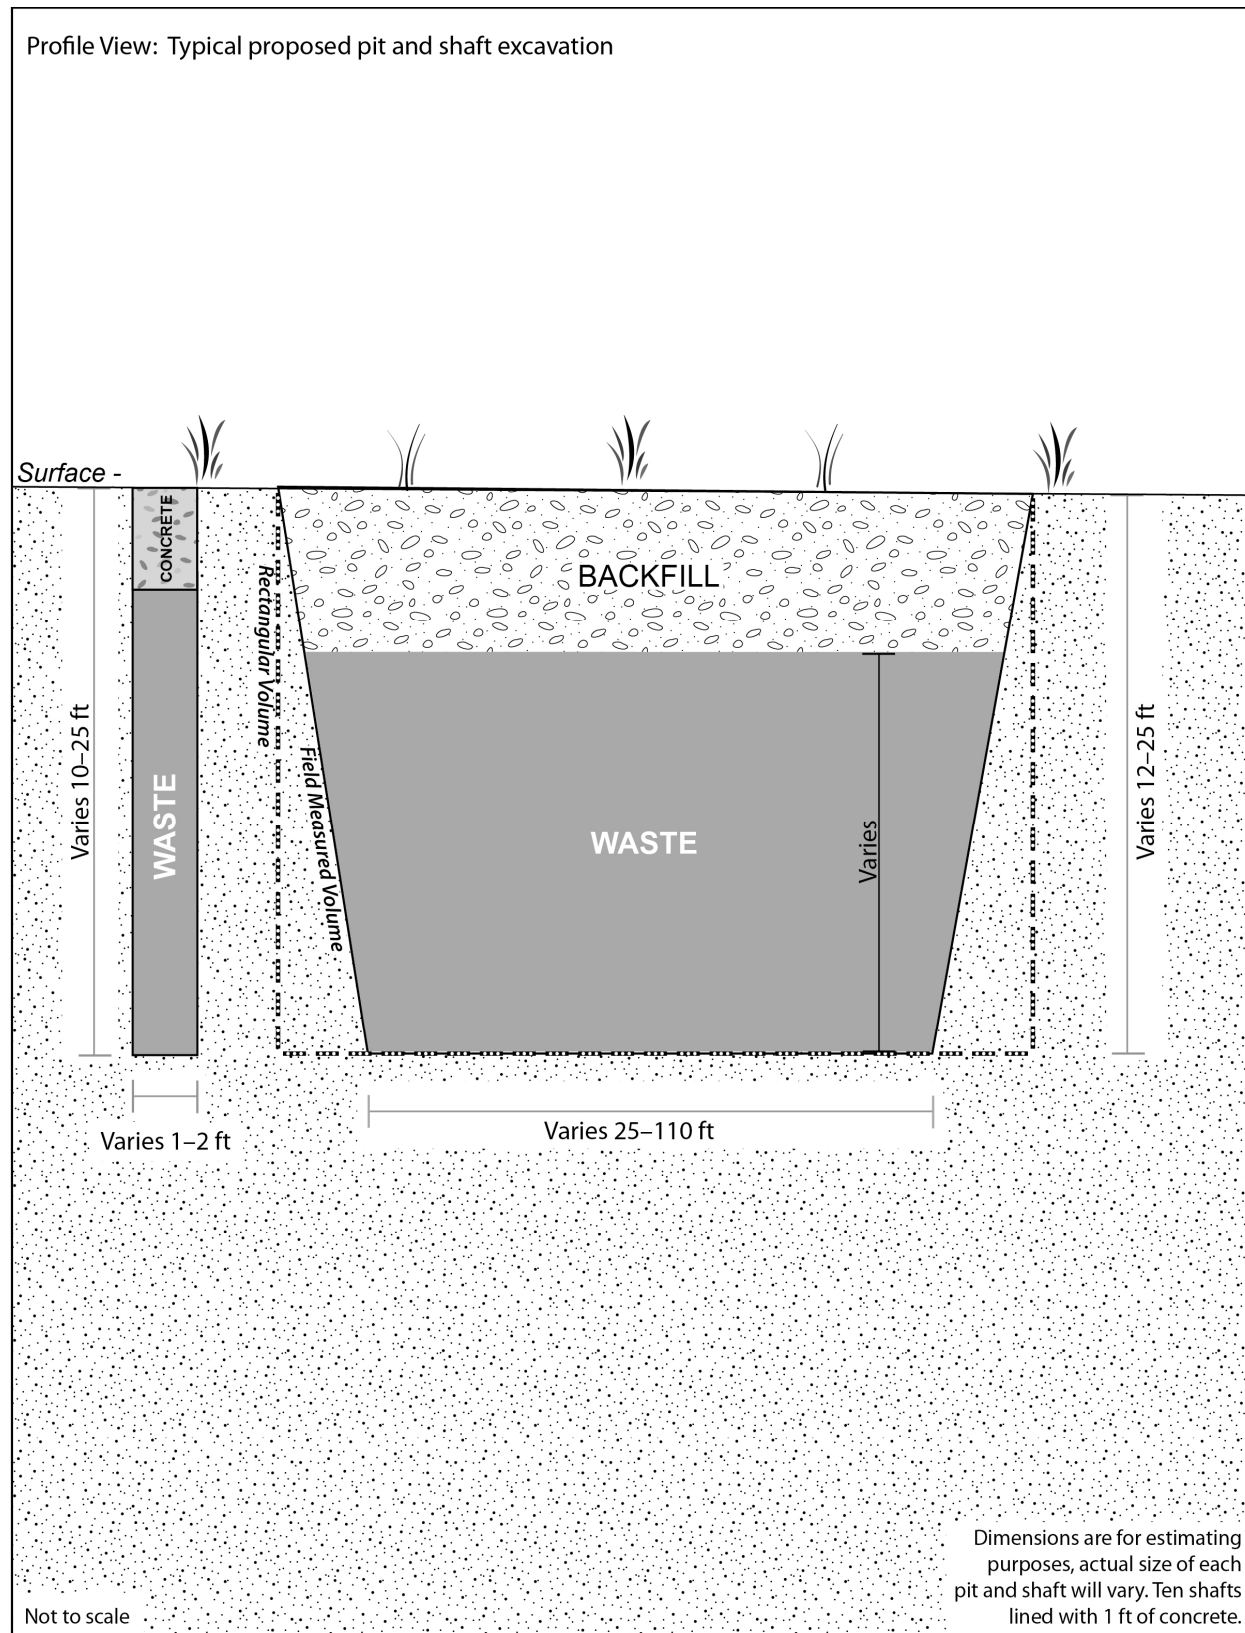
Typical cross-section of pit and shaft excavation
